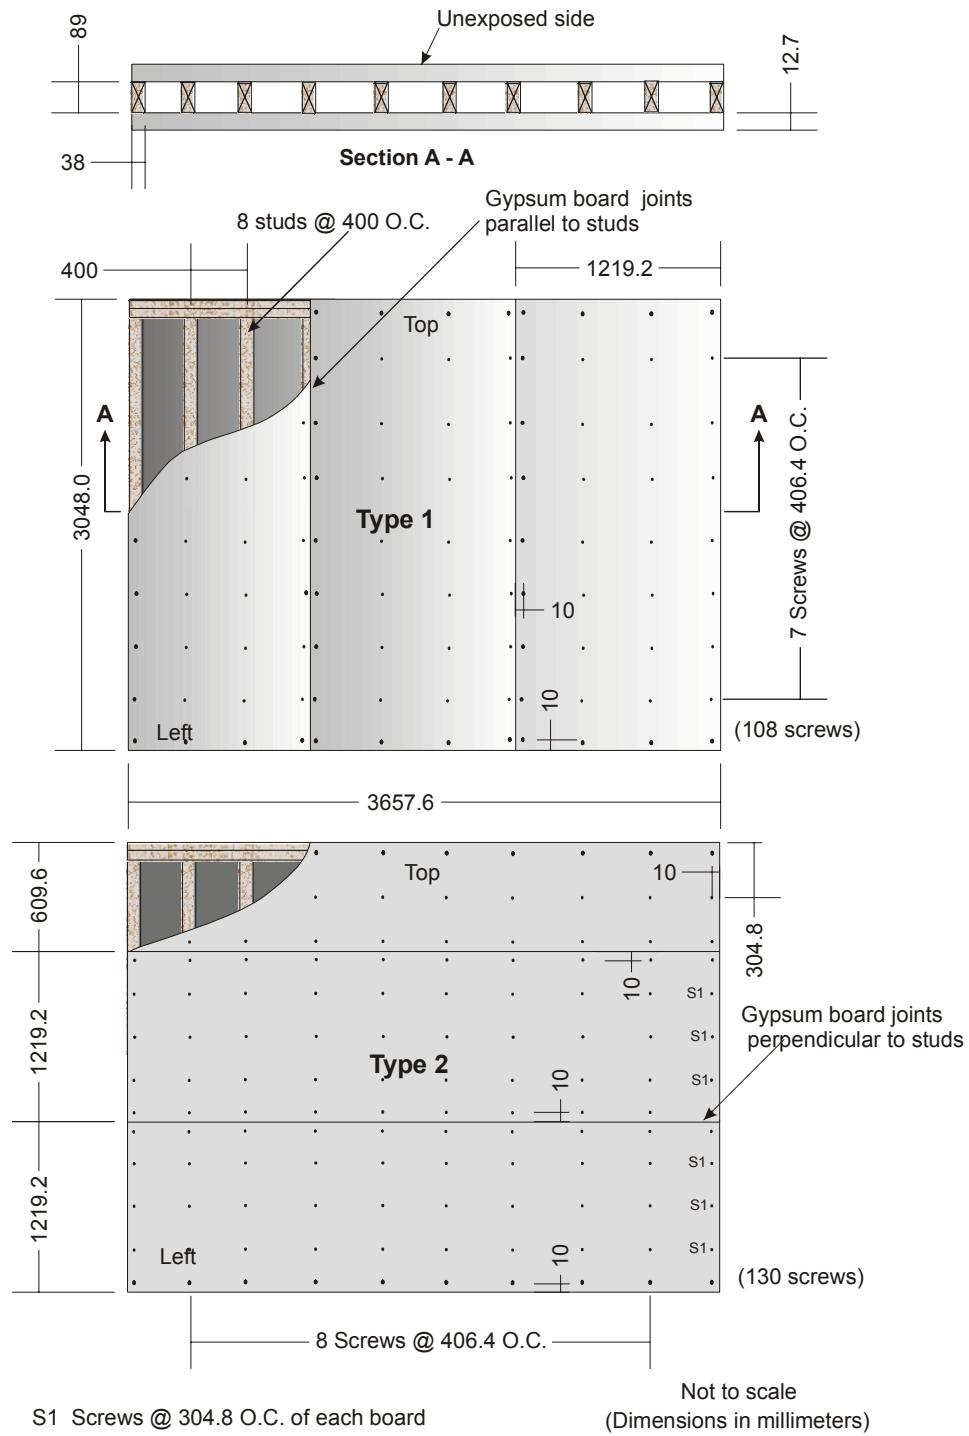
Dimensions and layout of wall assemblies (fire-exposed side shown)
